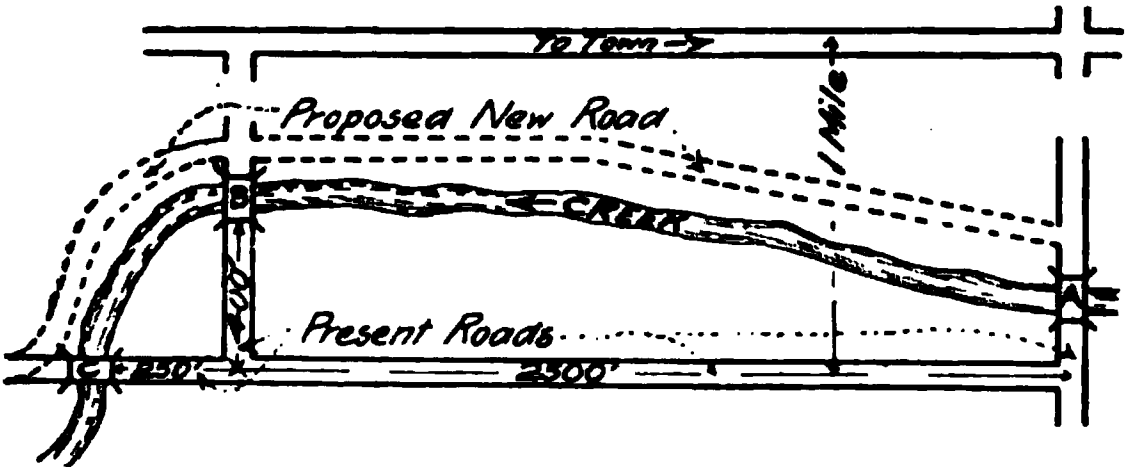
Showing three bridges, A, B, C, where if a road were put in as shown by the dotted lines only the bridge at A would be needed, and the public convenience would be served just as well as with the present arrangement.
